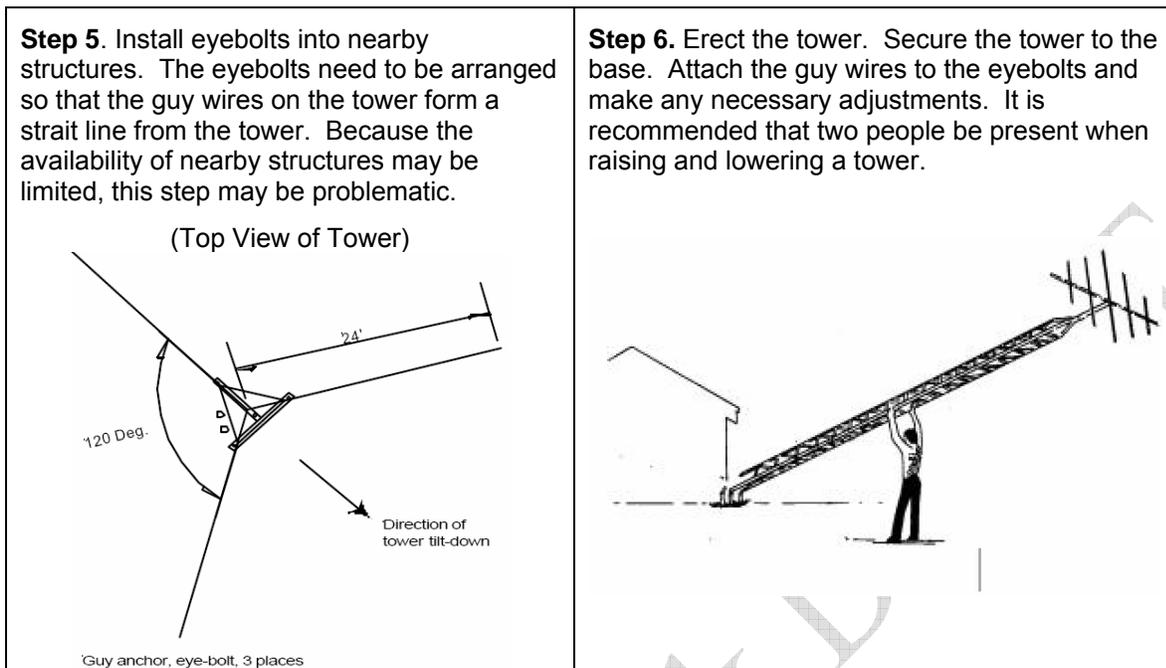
Roof Installation Procedure (Steps 5-6)
